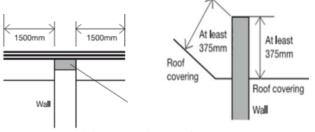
Horizontal Fire Safety Measures Fire Stop and Fire Break (a) & Wall Extension (b). Source: Fire Performance of Green Roofs and Walls [1]
